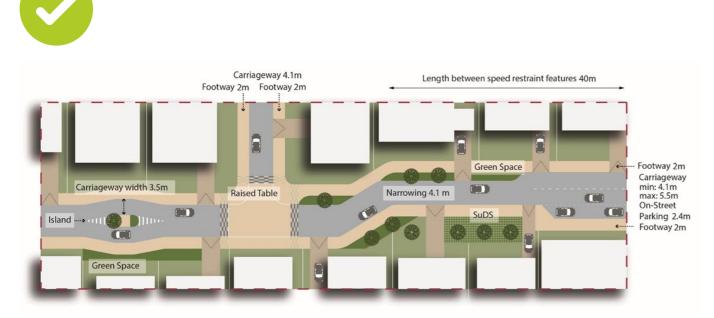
Street Typology Plan for a Local Street in a Coastal Context
